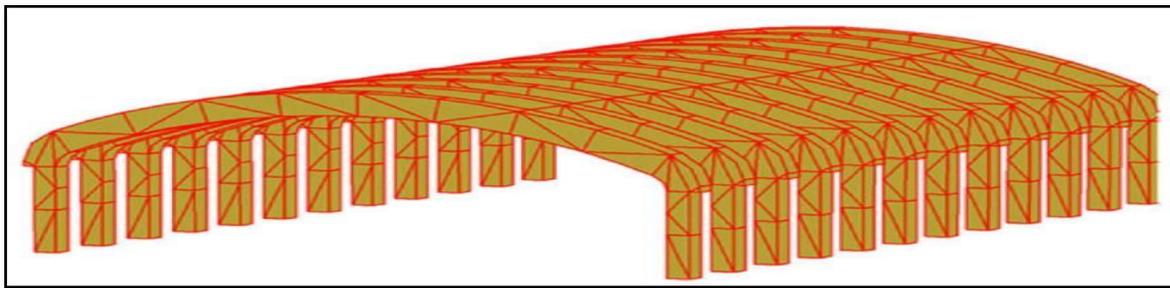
Rib-shape pre-supporting structure (CAPS) constructed prior to main excavation [10]. The previously mentioned approach has several technical drawbacks. Because of the outdated technique and its slow adoption of technological automation, labour is still needed for excavation even at this rapid pace of innovation. Additionally, there is no control over the quality of the reinforced concrete ribs in this procedure, therefore safety is unsatisfactory.
